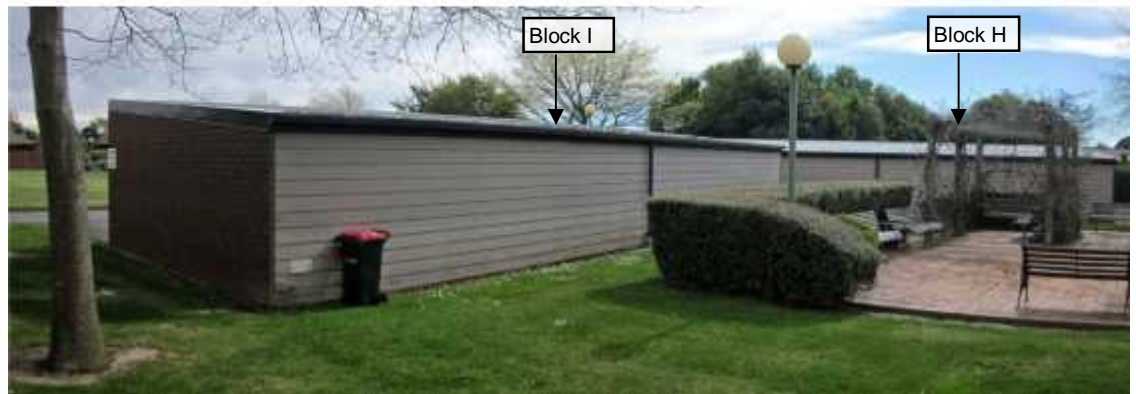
Blocks H & I (garages) – Exterior south view of the property.
